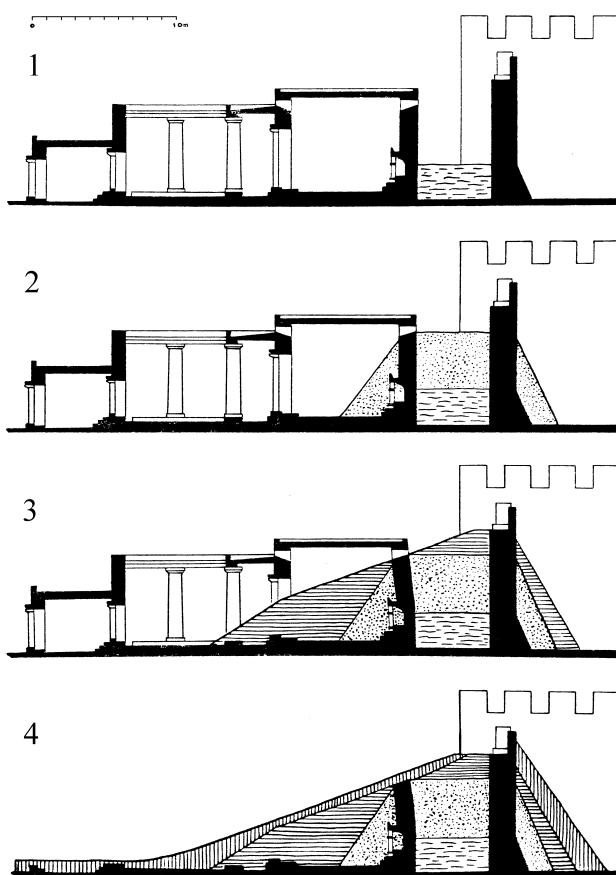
Cross-section of the 'desert' wall, Wall Street and block L7, through the synagogue, looking south towards Tower 18. It shows the deposits accumulated in Wall Street during Parthian times (1), and the strengthening of the defences which preceded the siege. The outward thrust caused by the filling of Wall Street was counteracted by the addition of a supporting glacis to the front of the curtain wall, and revetments inside the still-standing buildings behind (2). However, the latter proved inadequate. The rear revetment was greatly expanded (3), and then the exposed parts of the buildings demolished to create a deep sloping rampart easily accessible from the interior, while the glacis was also massively strengthened (4).
